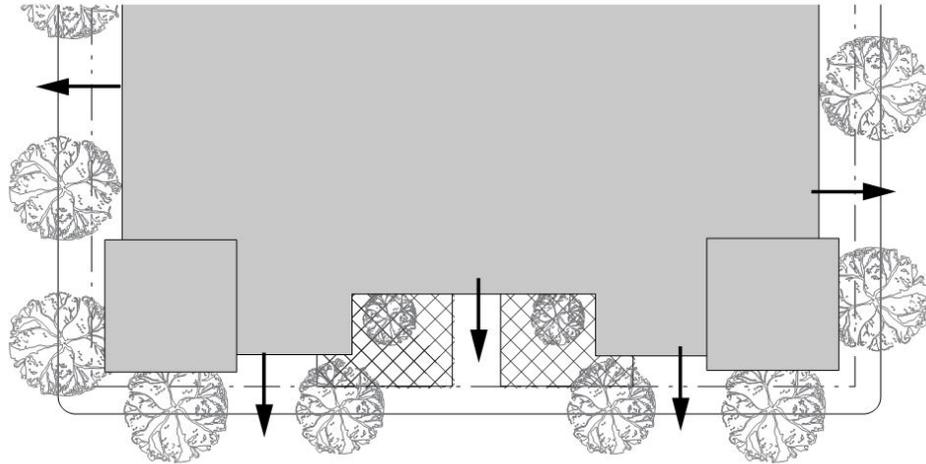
D-4: BUILDING ORIENTATION TO THE STREET
